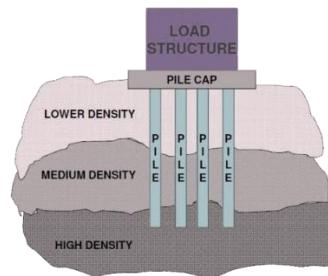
Foundation Type with Ground Section (Geology, 2016)
